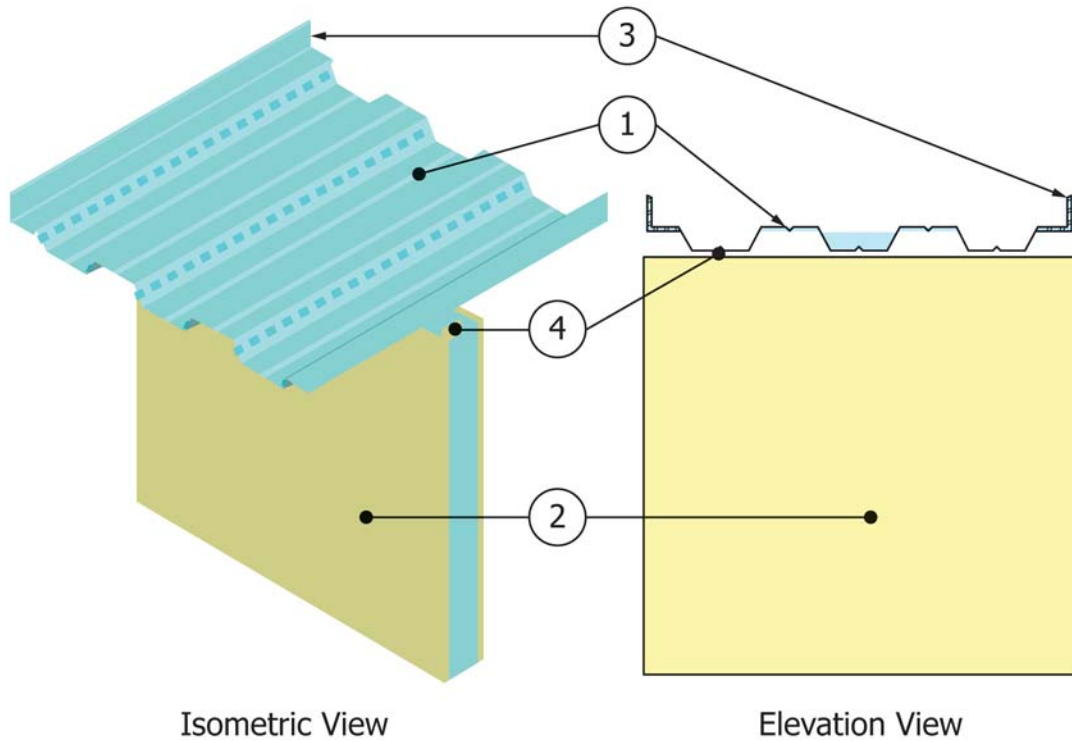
Example of Method A Configuration (Isometric and Front Views)
